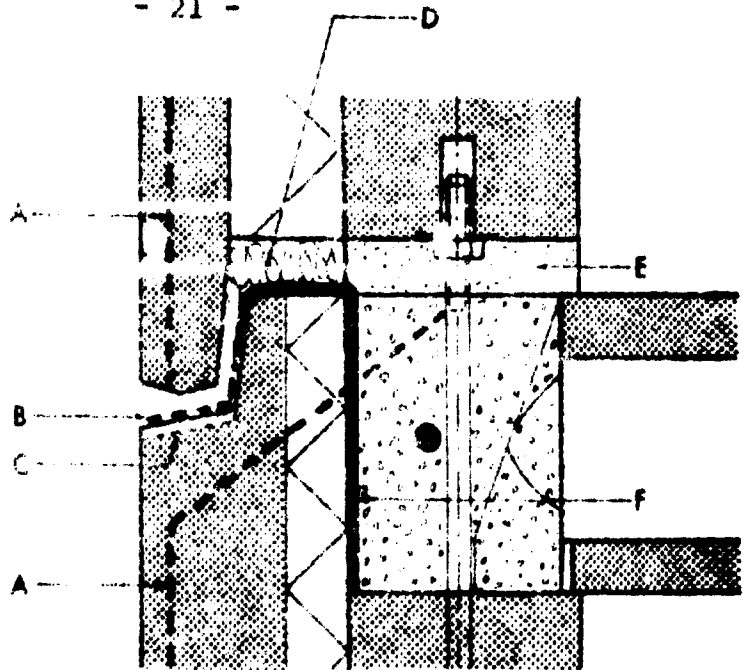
Figure M. Overlapping, Horizontal Joint in Concrete Facade.
